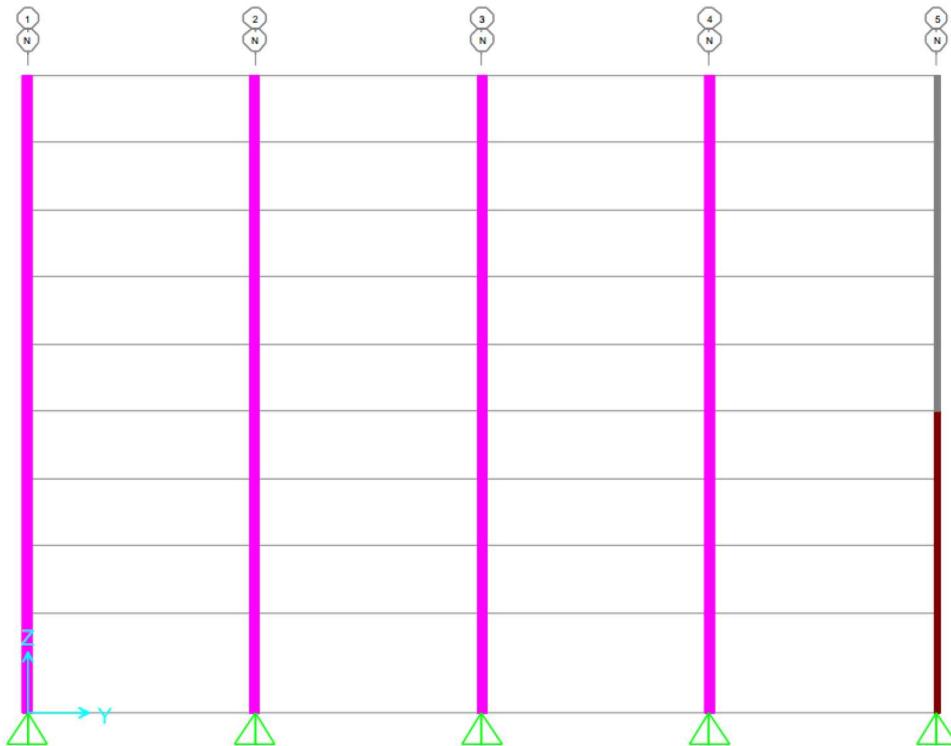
Column cross-section layout in the face N (SAP2000)
